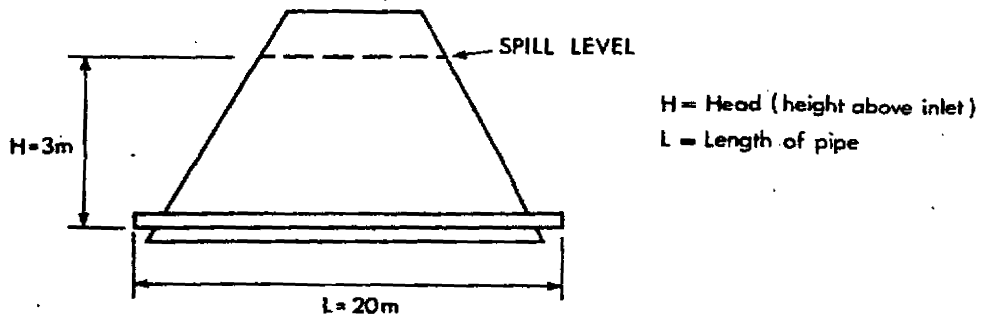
2:1 Soil conservation dam dimensions for pipe spillway design - worked example in section 2.2
